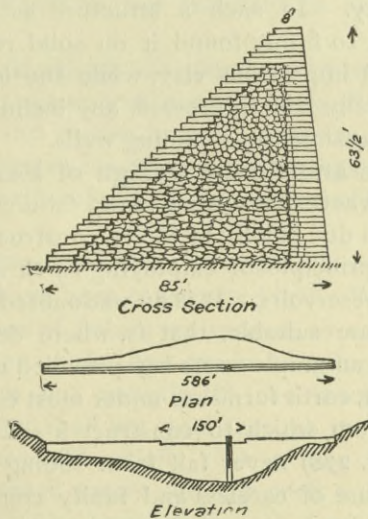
ELEVATION, PLAN, AND CROSS-SECTION OF CASTLEWOOD DAM.
